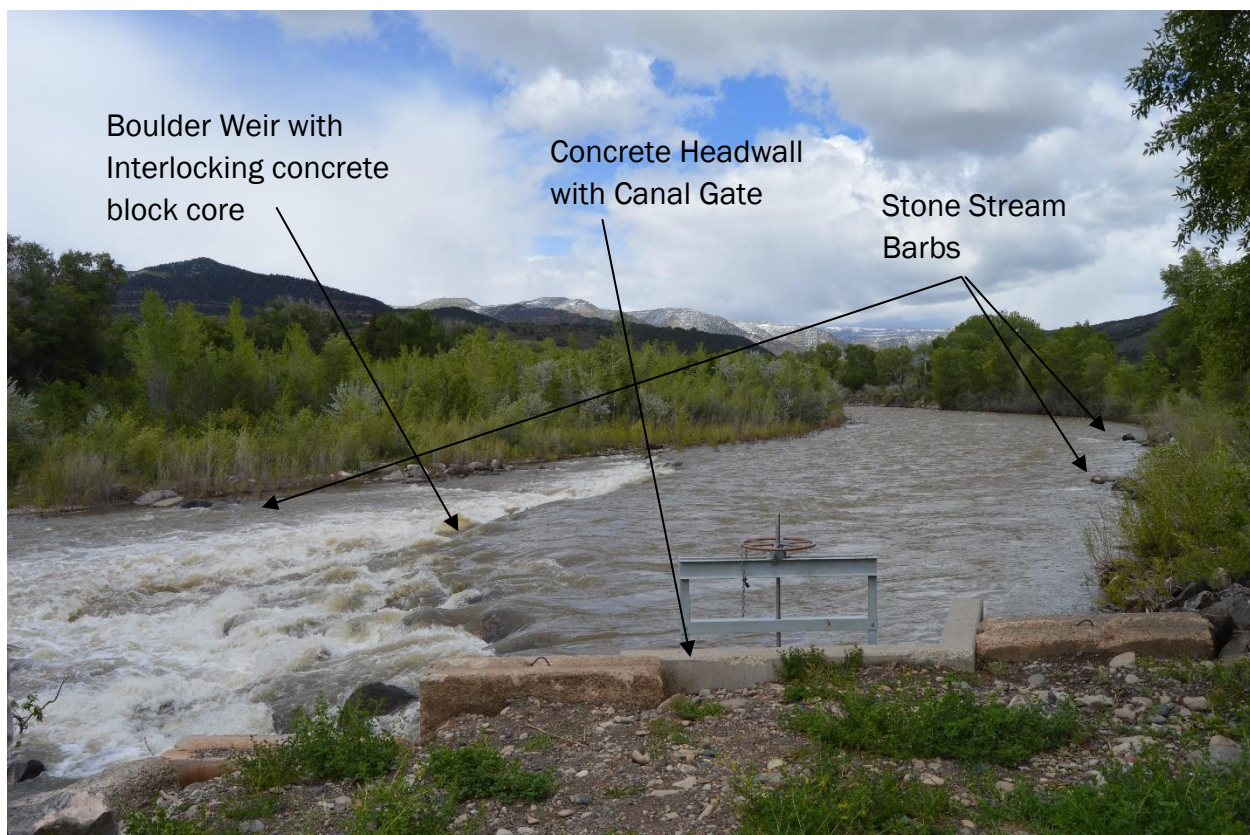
Boulder Weir and Concrete Intake Structure for Paonia Ditch
